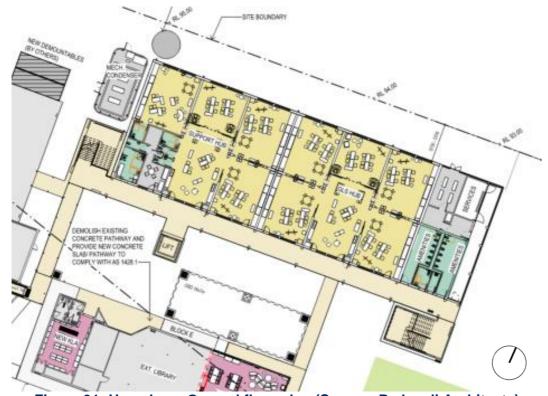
Homebase Ground floor plan (Source: Pedavoli Architects)
